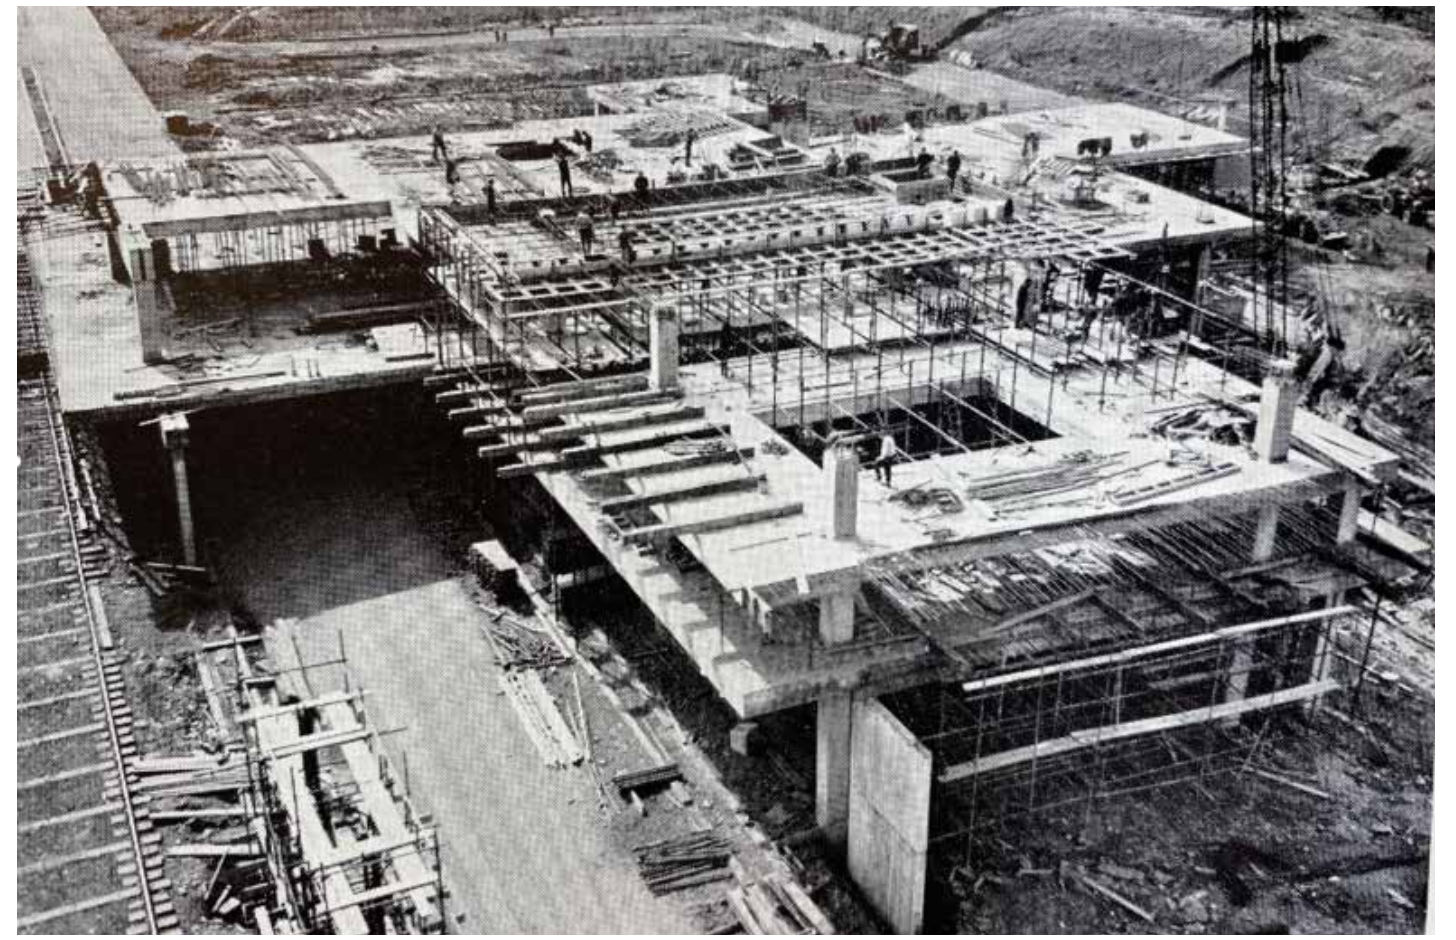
Photo of the construction of the car park and lower level Phase 1 Town Centre building, C 1962. NLC Archive
